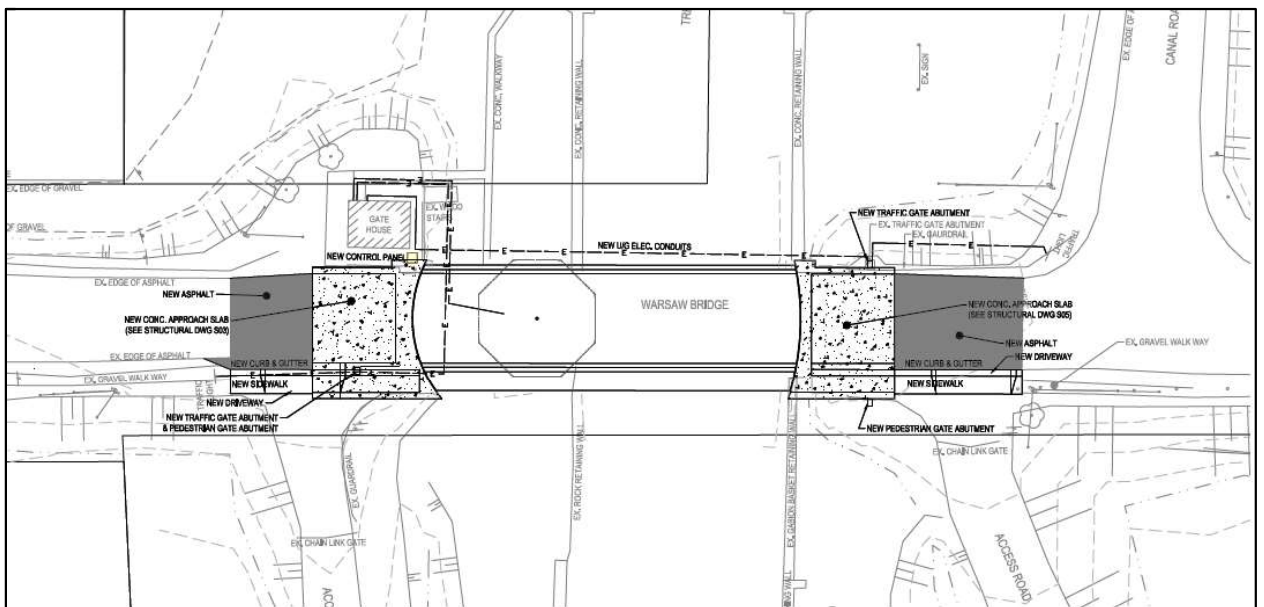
Anticipated Site Plan for the Bridge. See Appendix B for additional information.
